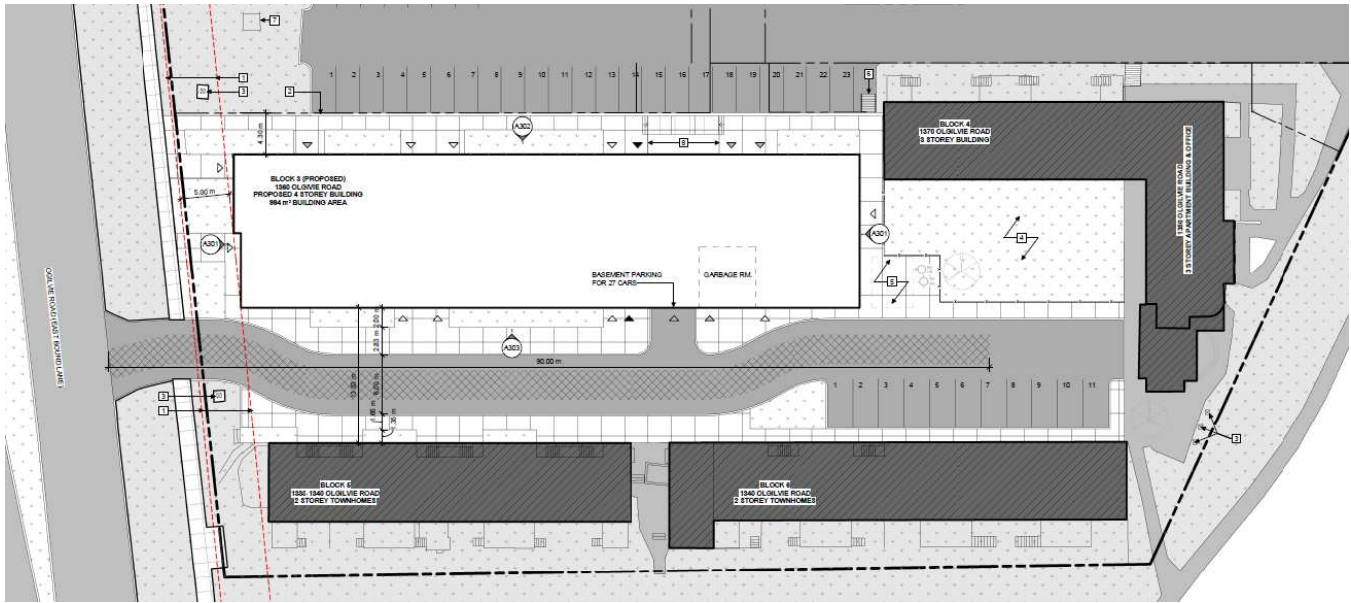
Extract of Site Plan submitted for second Pre-application Consultation
